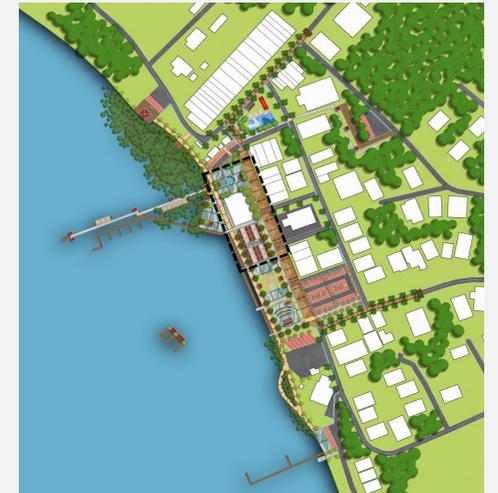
Highlighting the selected area for detailed development plan at the previous masterplan
